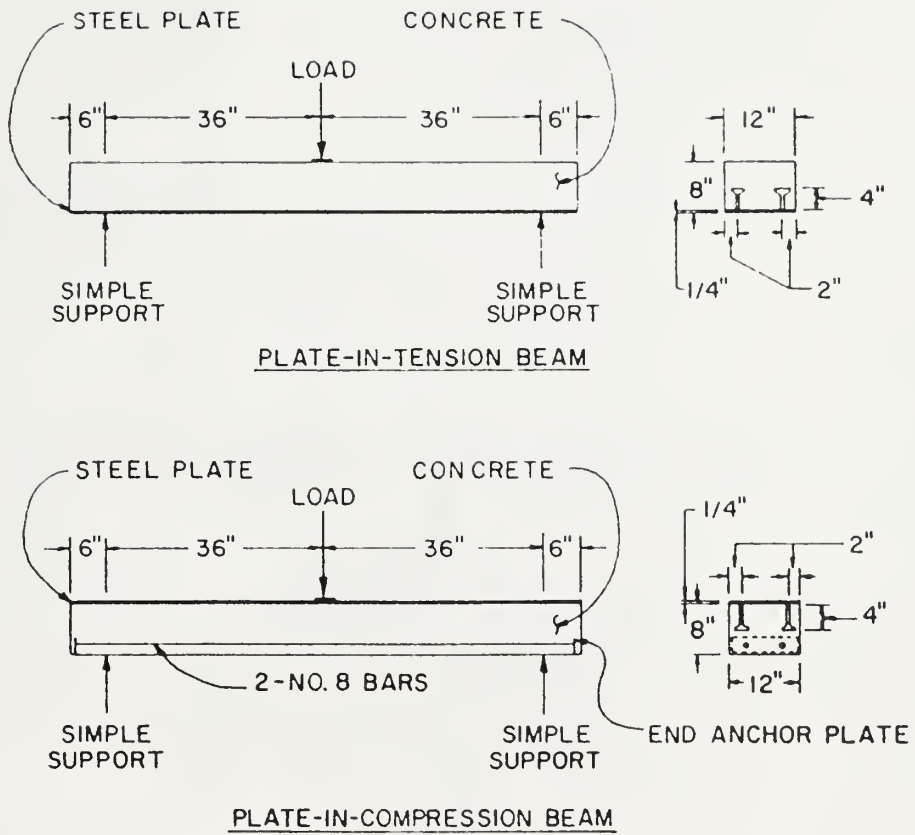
, Schematic of the Composite Beam Specimens tested by Perry.
